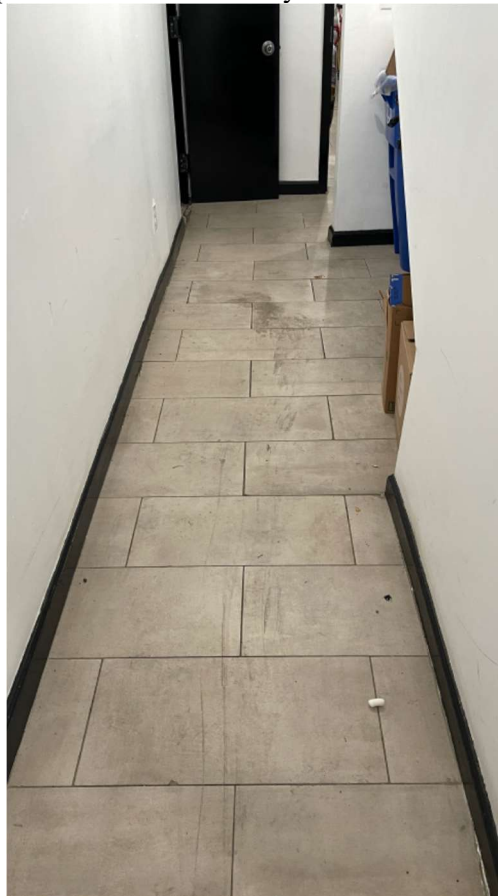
View of tile covered slab in the hallways of 237 Kent Avenue.
